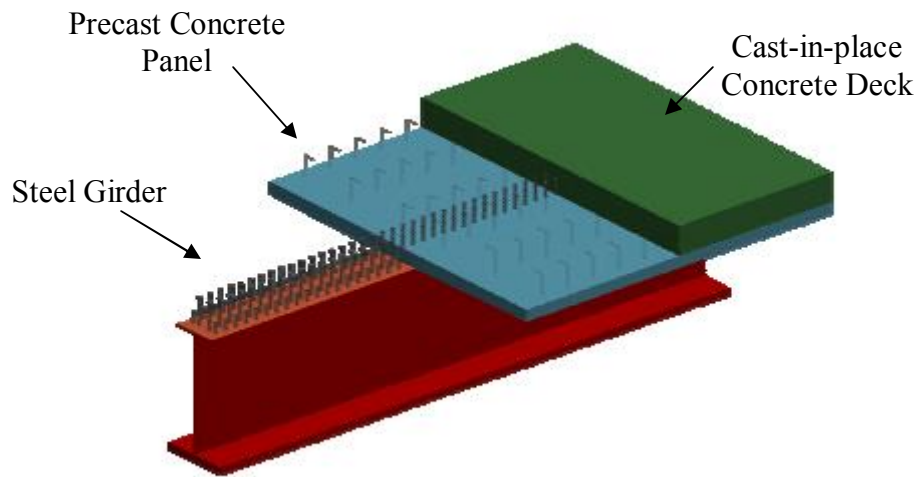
Partial-depth concrete decks prefabricated on steel or concrete beams (FHWA, 2004)
